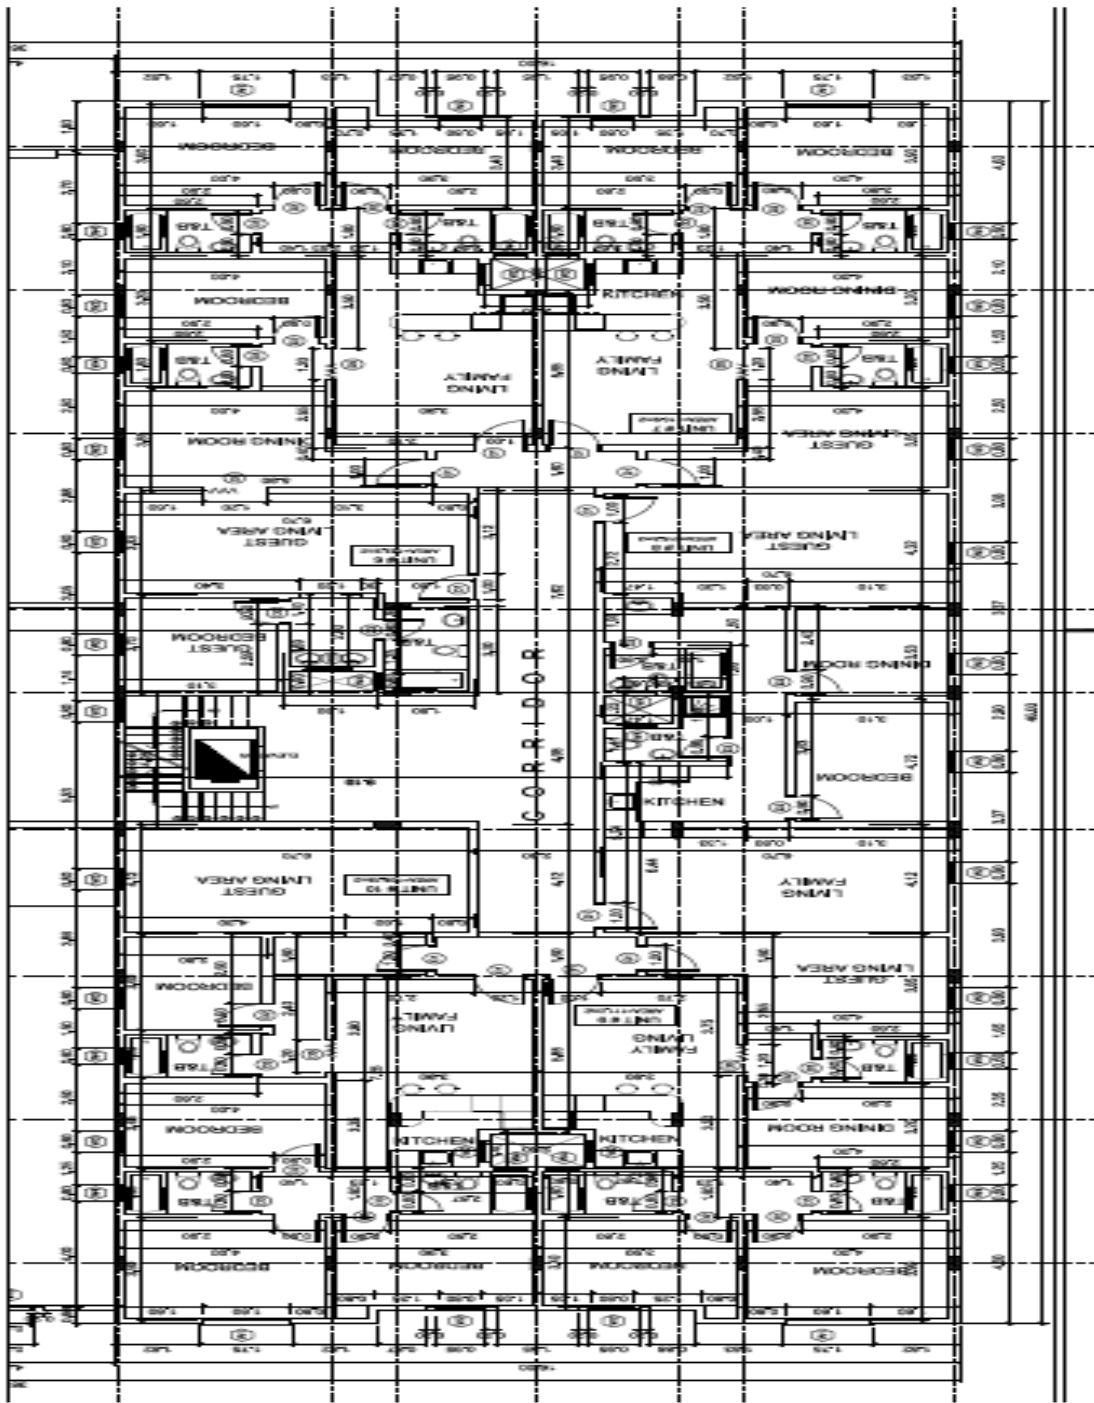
Typical floor plan 1<sup>st</sup> and 2<sup>nd</sup> floors
